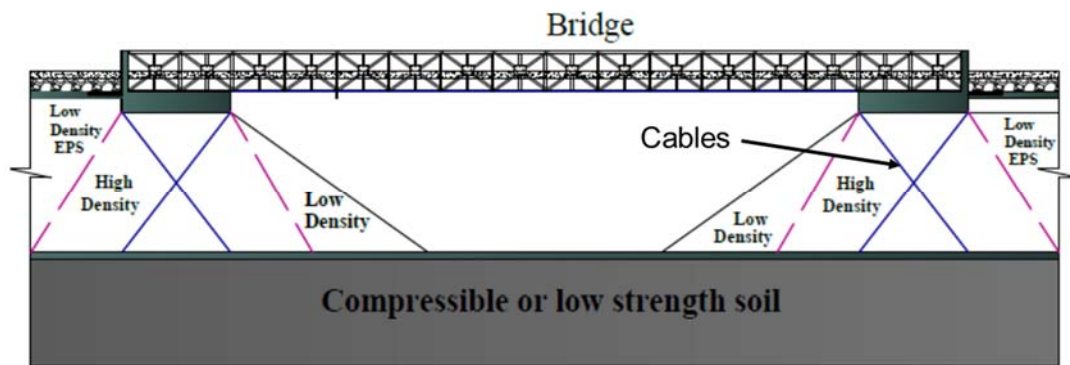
Conceptual bridge support with a trapezoidal prismatic shaped EPS embankment
